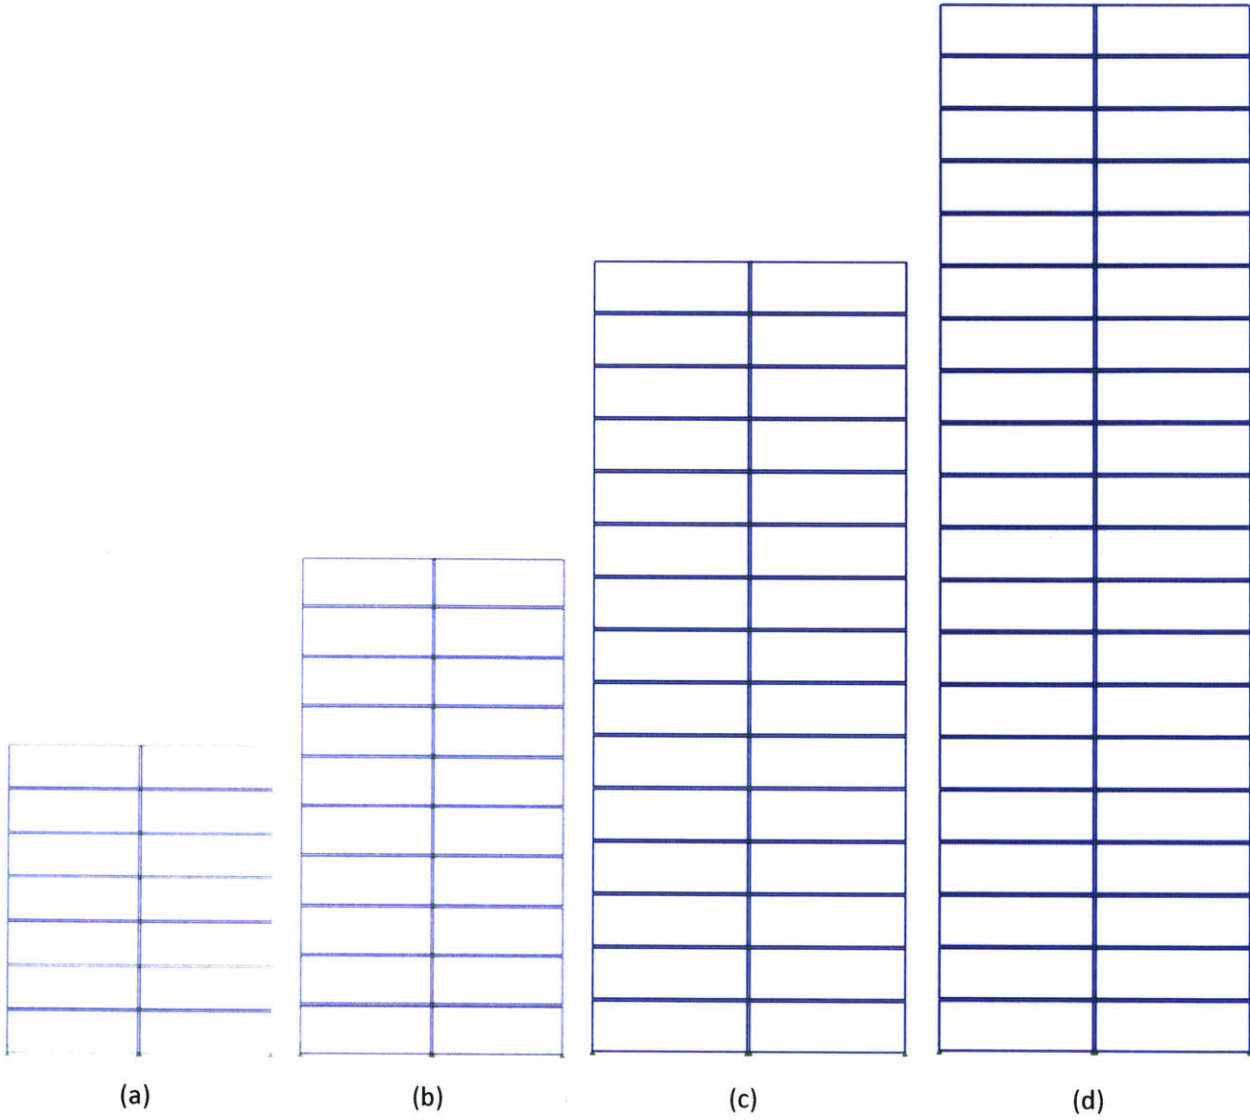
MODULAR PROTOTYPE SIZES (A) 7 STORY (B) 10 STORY (C) 15 STORY (D) 20 STORY
